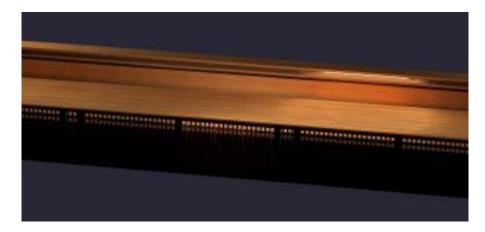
Rendering of bridge deck lighting, embedded in the underside of the railing, shining at low levels onto the deck surface. The rendering shows lighting at the center of the bridge, and the lights at the two ends of the bridge (options to be discussed).
